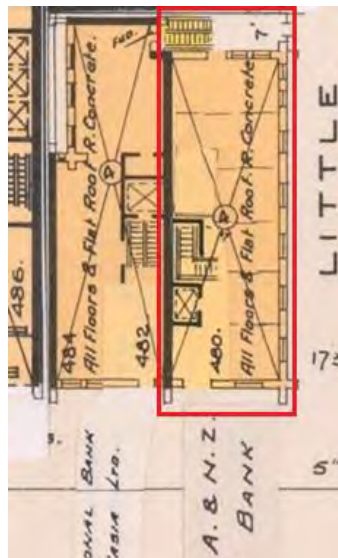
A detail from a 1948 Mahlstedt plan shows only one alteration to the building at this time; the removal of an interior stairwell. (Source: Mahlstedt Map Section 1, no 16, 1948)
